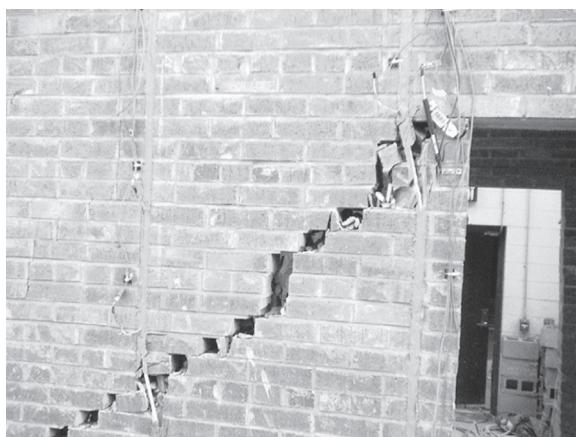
Diagonal tension failure and GFRP NSM rod rupture of the symmetric retrofitted brick structure.
